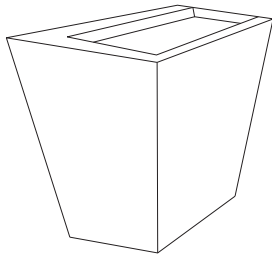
Sketch of ashlar, reused in the façade of city wall II, 1:10.
